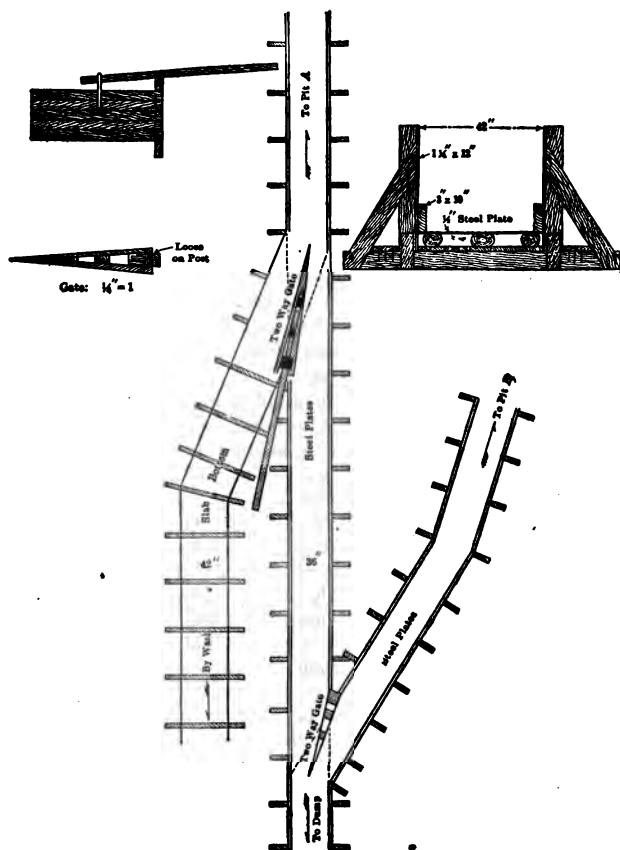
Arrangement of Sluices, Details of Two-Way Gates; and Cross-Section of Gold-Saving Sluice.
